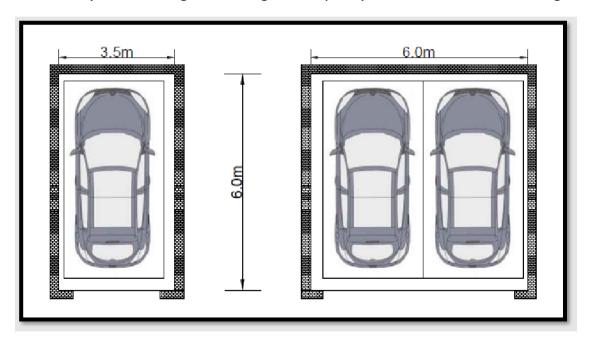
Internal dimension requirements for garages and parking spaces surrounded by walls or solid features
